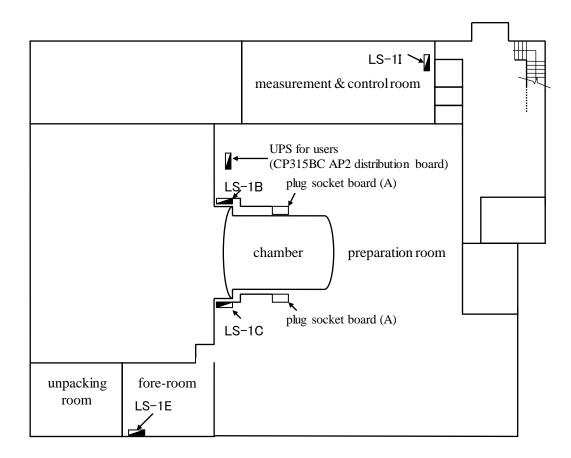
Configuration of Distribution Boards/Plug Socket Boards
